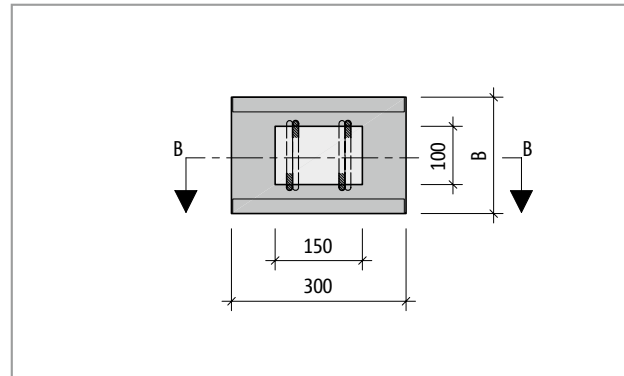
Schöck Sconnex® type W-N-VH: Product plan view, pressure bearing area 150 × 100 mm
